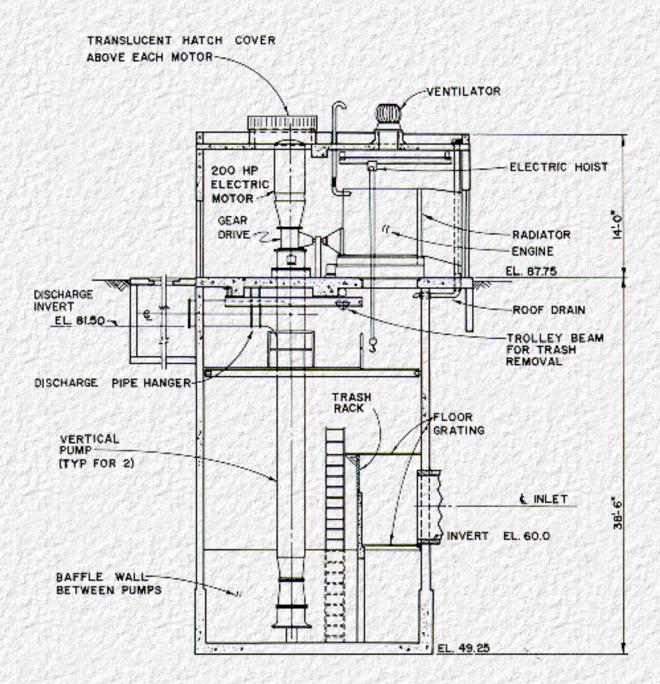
Wet-Pit Type Pump Station Showing Machinery Layout, Combination Drive
